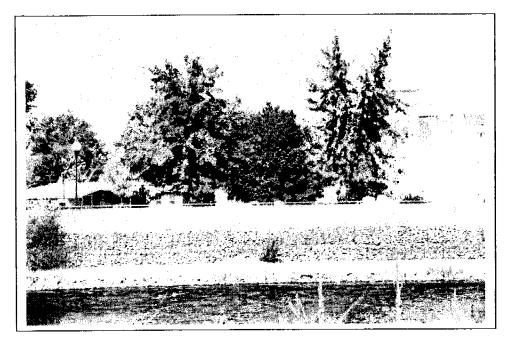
Section D, south bank, west end of Island Avenue, camera facing southeast, 10/26/01.
